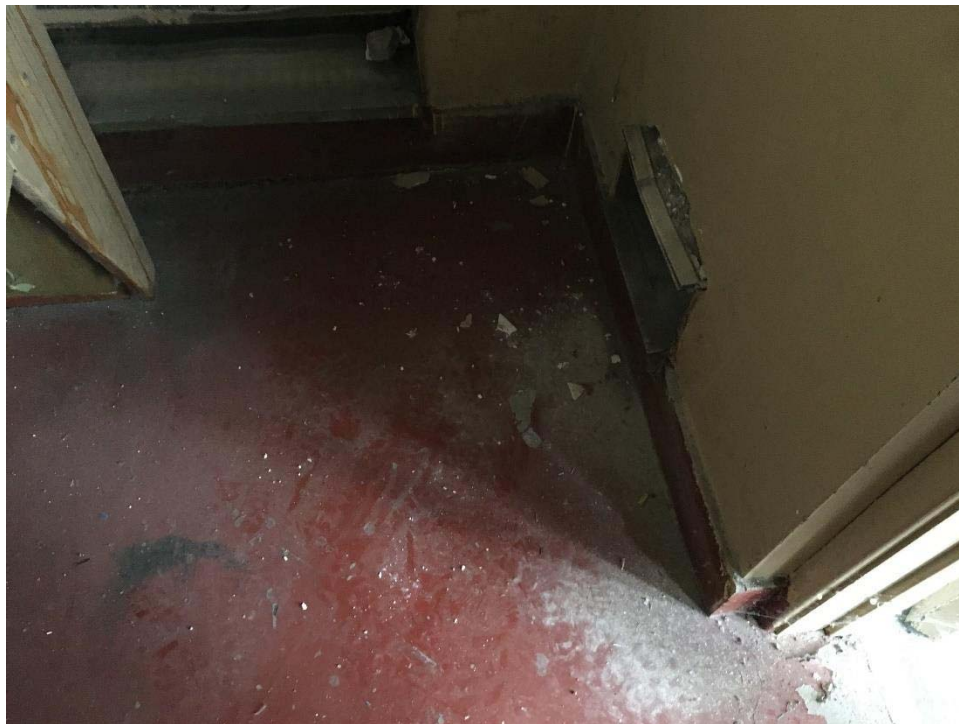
View of the asbestos-containing plaster debris observed in Location 5 in the Fan Room of the ground floor.
